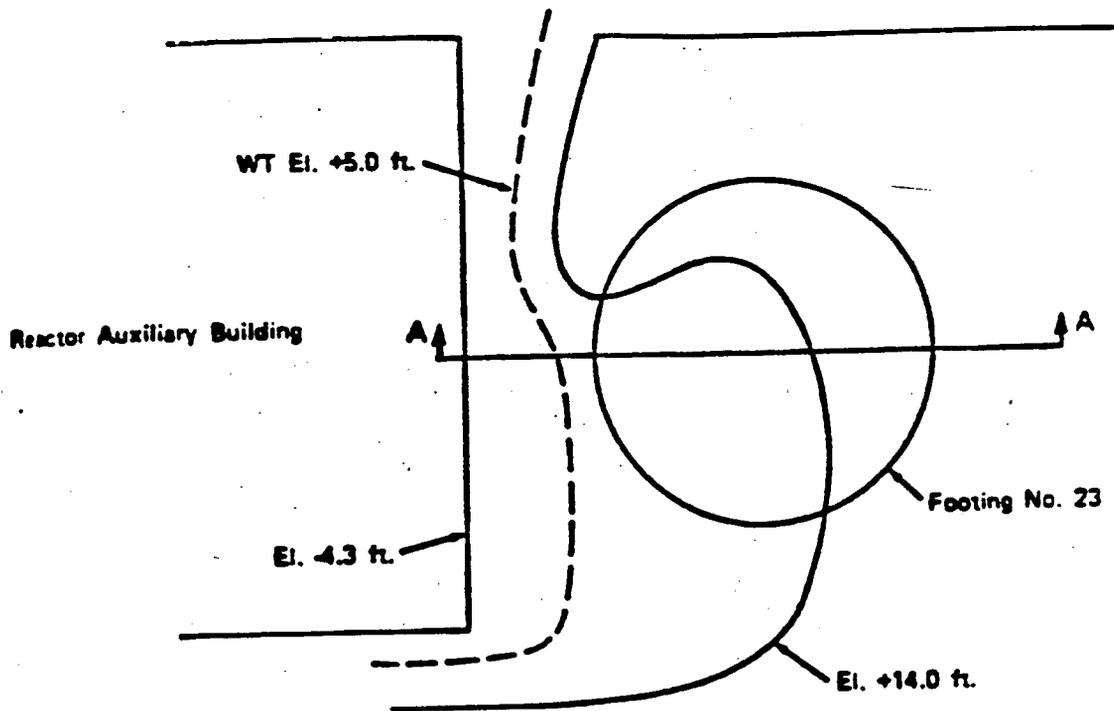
Local Soil Conditions Under Refueling Water Storage Tank, Item No. 23
